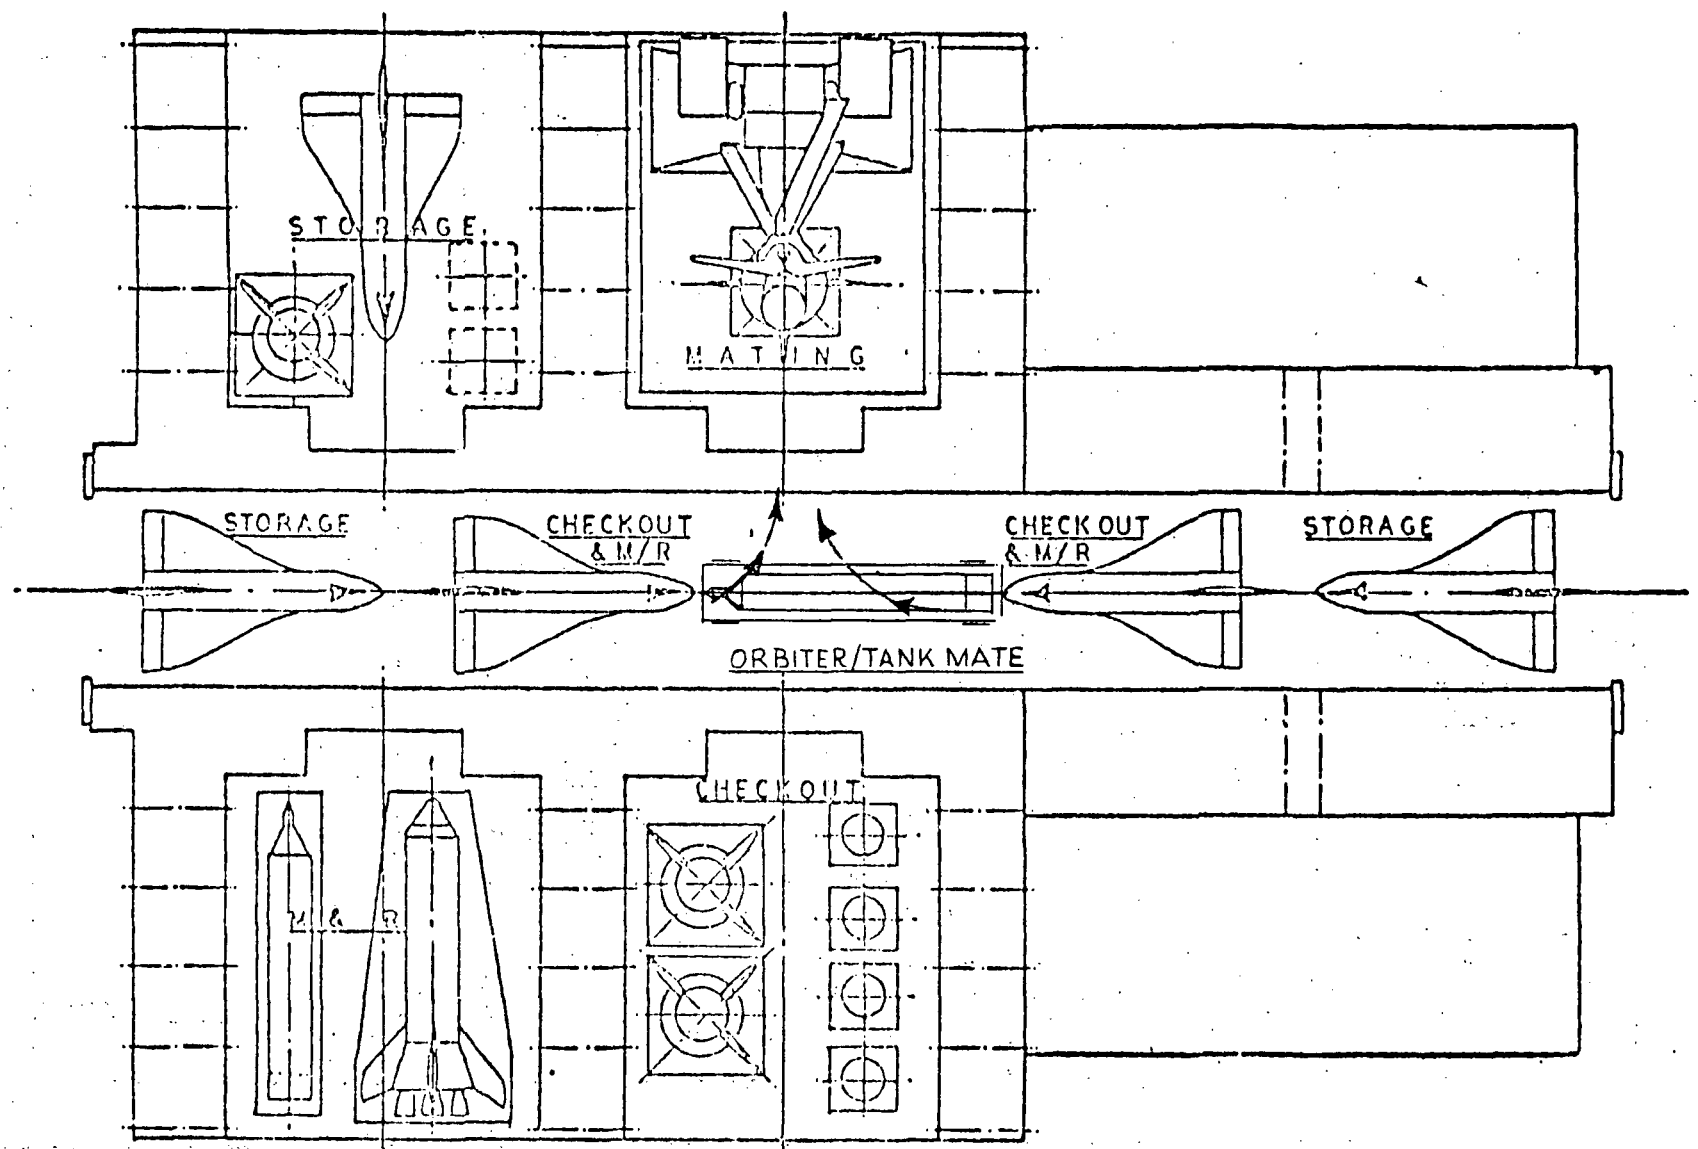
Pressure Fed Booster VAB Floor Plan
